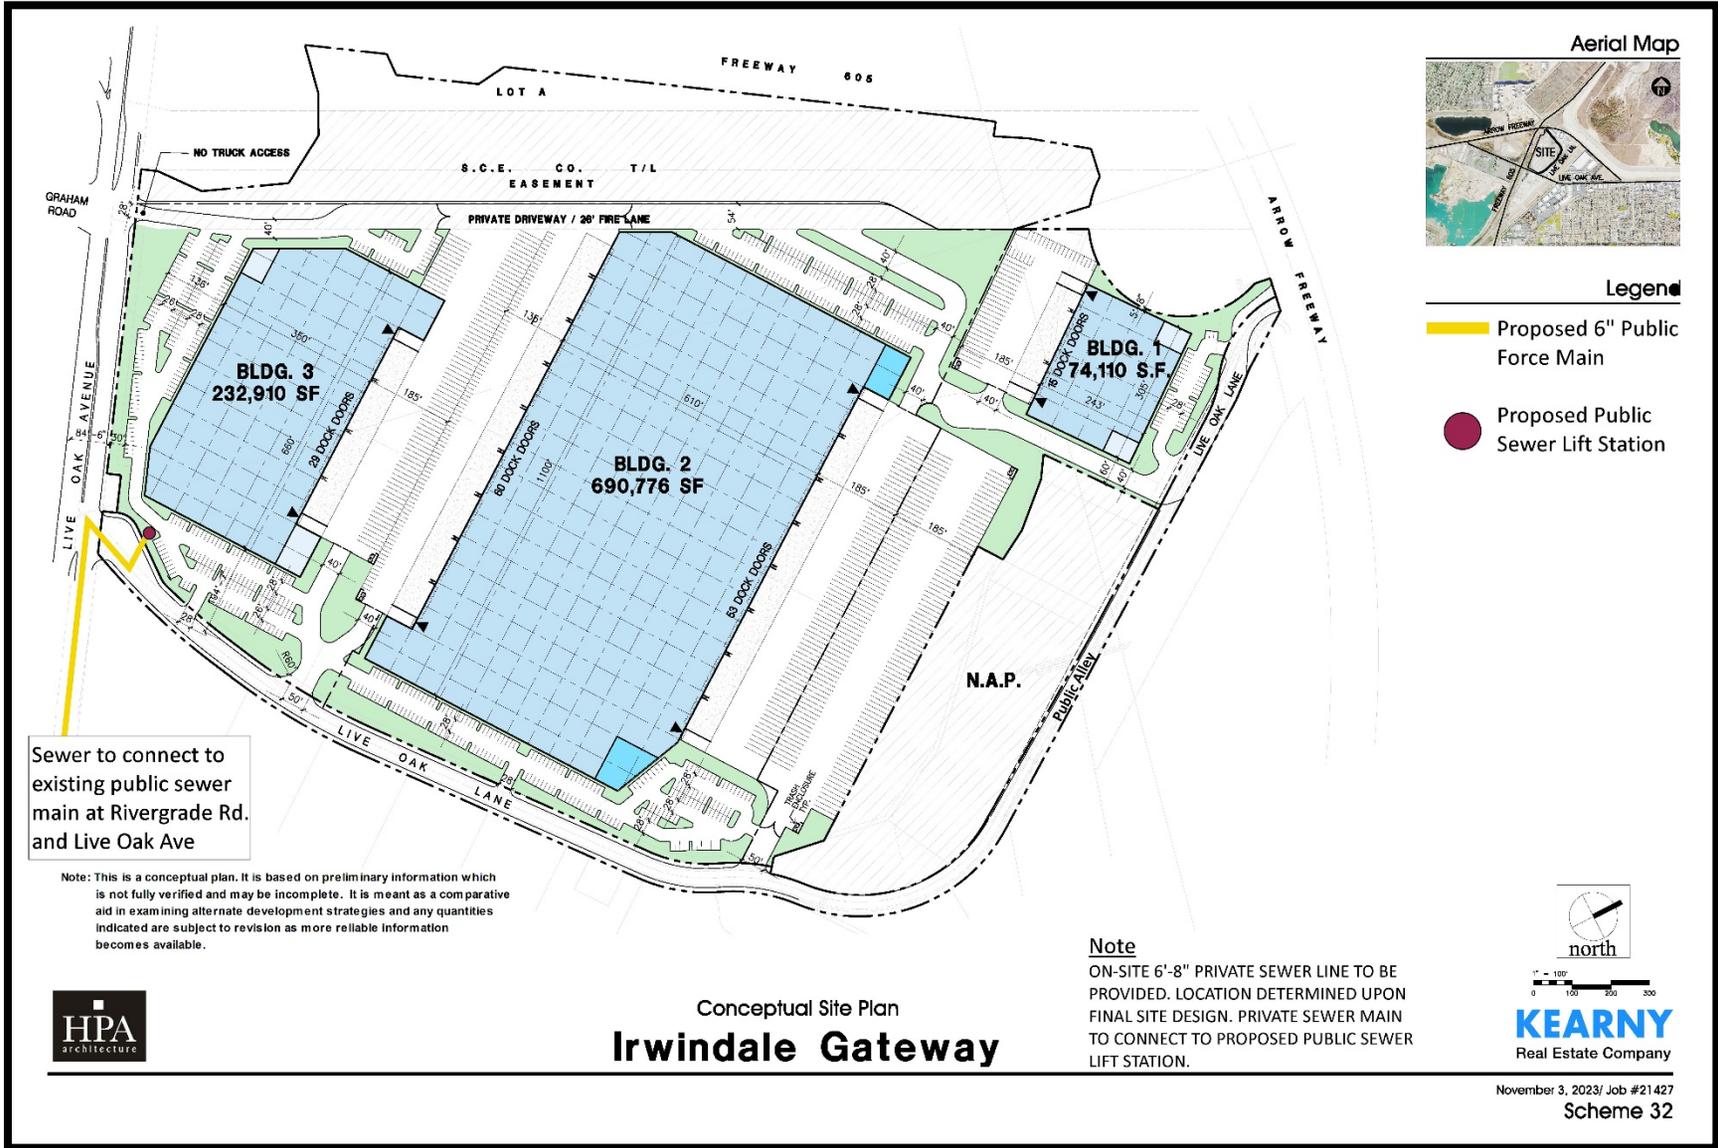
CONCEPTUAL SEWER PLAN WITHOUT BESS
